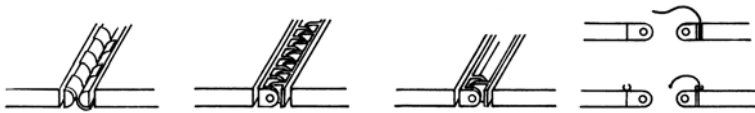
Plate-plate connections; possible designs and sealing.
